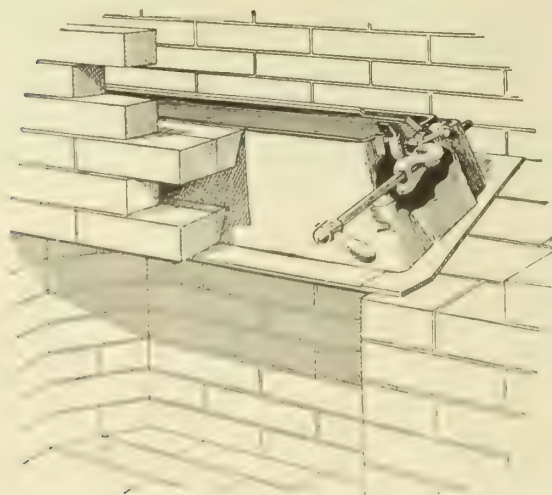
FIGURE VIEW OF NO. 17 DAMPER INSTALLED IN FIREPLACE
